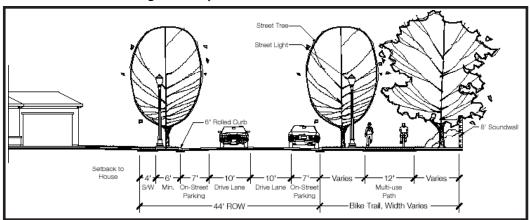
Neighborhood Street at Parkway - Woodbridge by Del Webb, Section N
